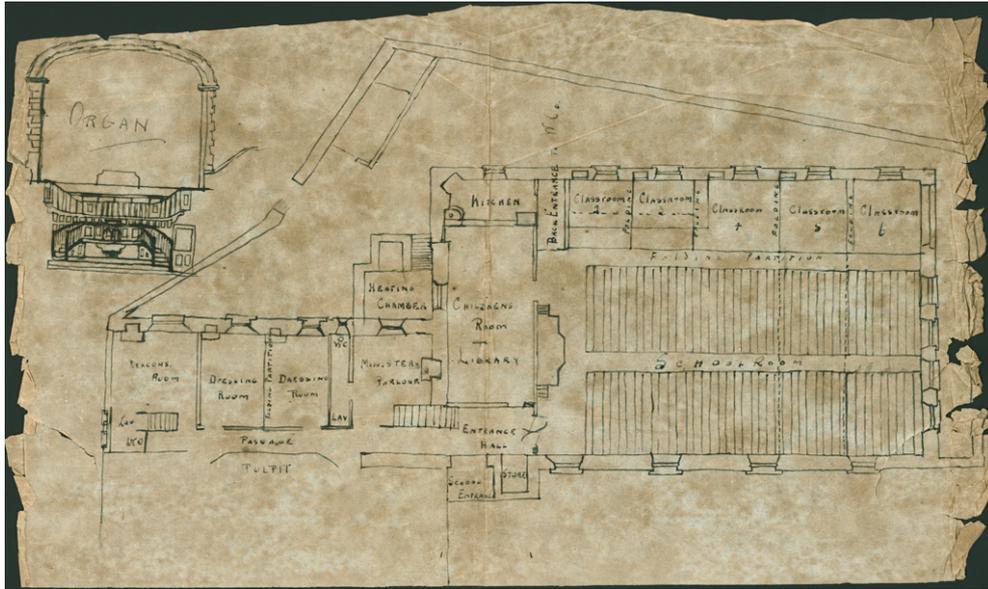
Early layout Bethania Chapel, Maesteg, (Source: Welsh Religious Buildings Trust via RCAHMW)
